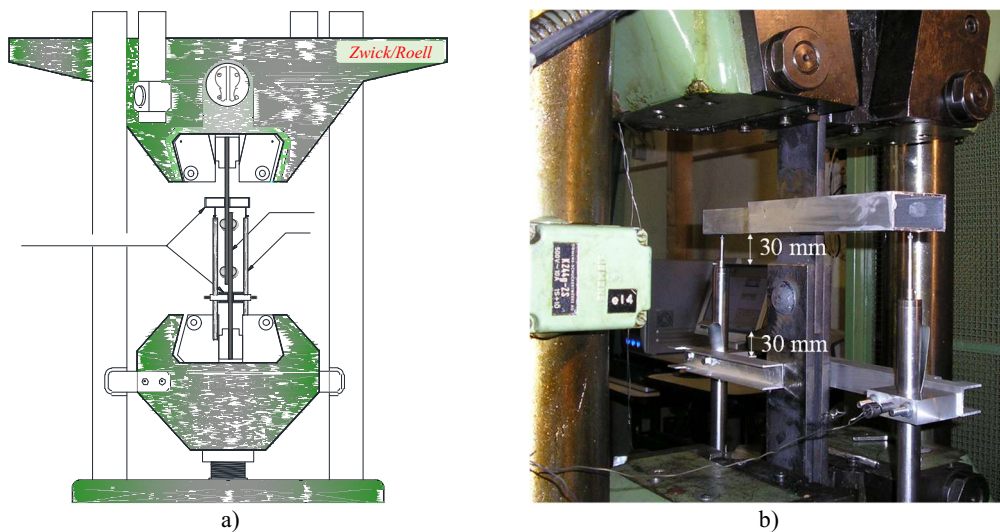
Static tests on hot-driven riveted connections: a) Zwick/Roell testing machine and b) example of specimen being instrumented with LVDTs (*D'Aniello et al., 2011*).
